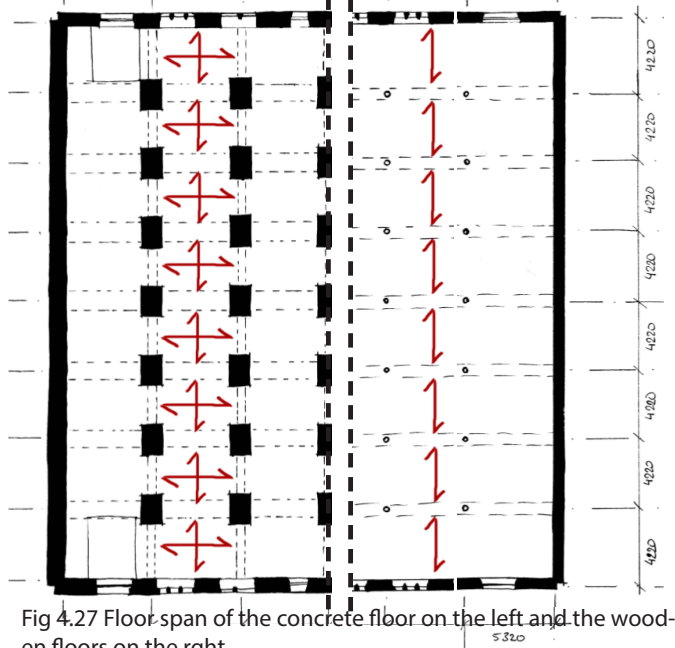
Floor span of the concrete floor on the left and the wooden floors on the right.
